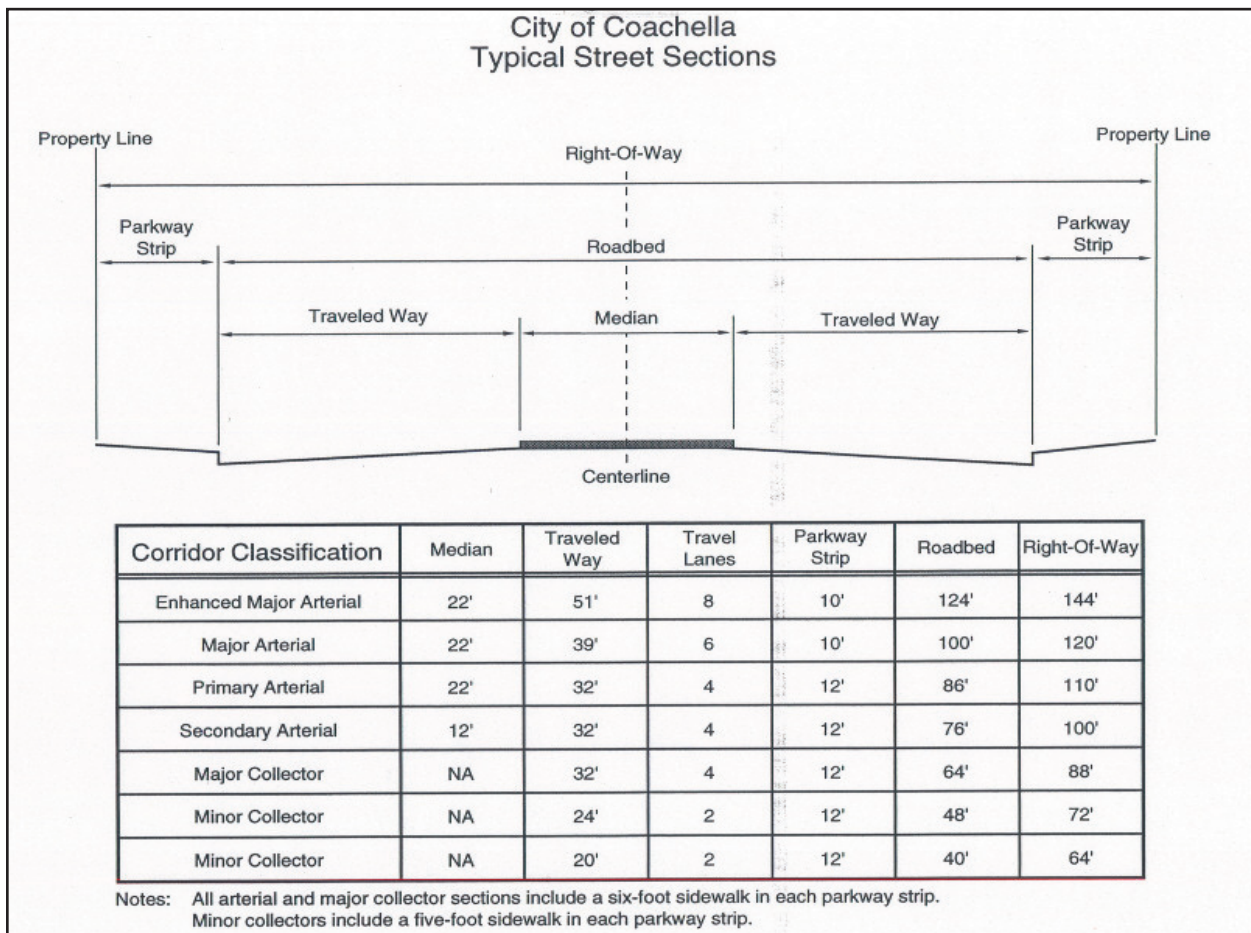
Typical Street Section as classified by the Coachella General Plan 2020. The General Plan also calls for 12-foot lanes, which are unnecessary in urban areas, and does not accommodate bicyclists on larger streets.
